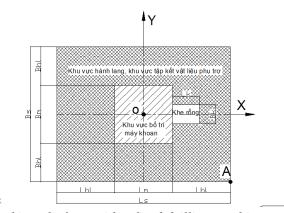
Floating working platform with a fixed drilling machine according to option 1
